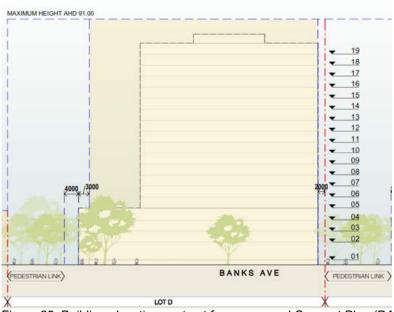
Building elevations extract from approved Concept Plan (DA-2019/386)
